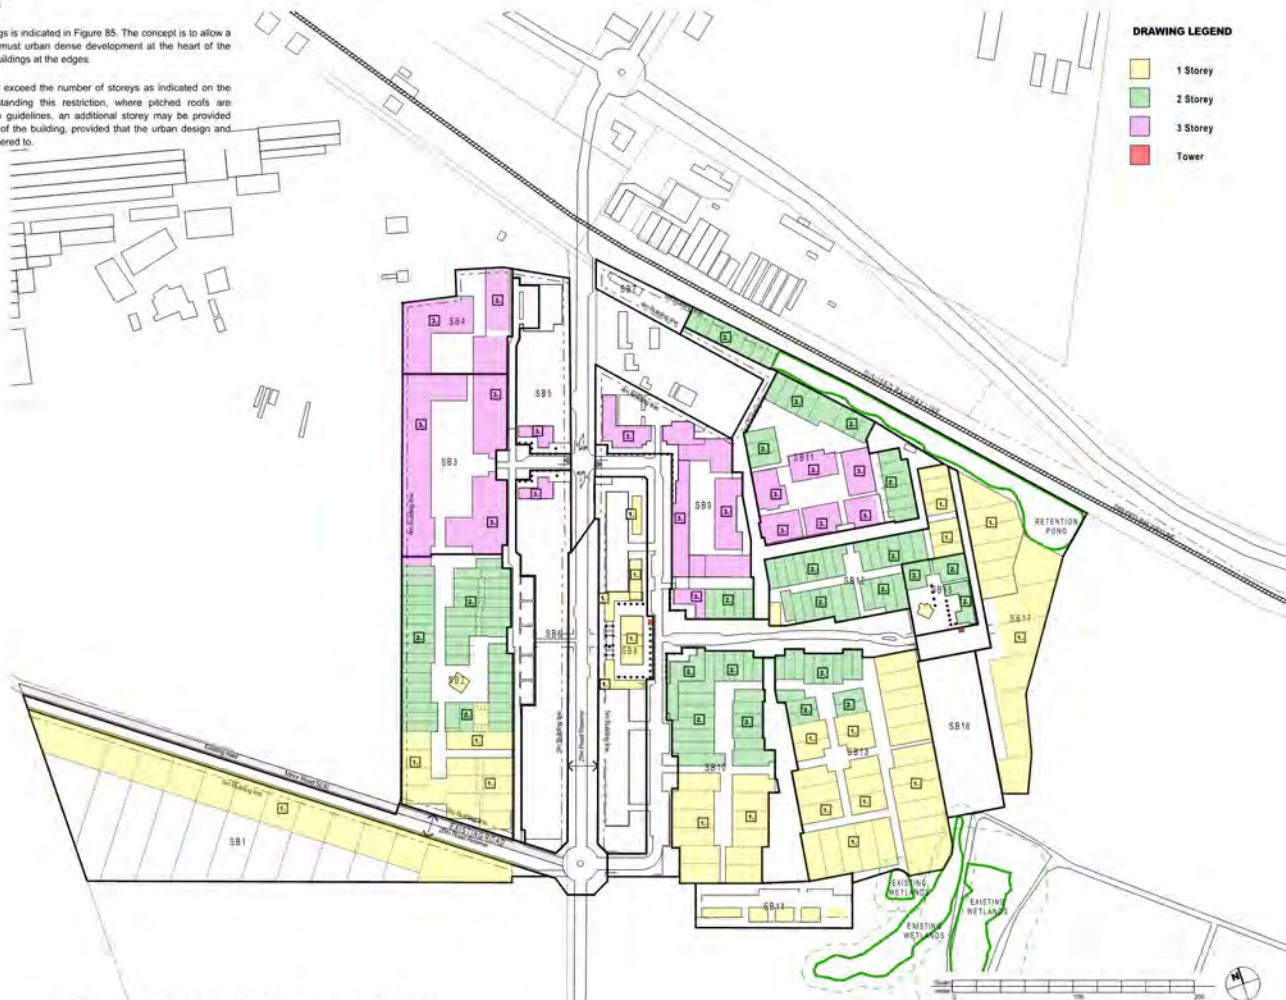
Maximum Permissible Building Heights | scale 1:3000 @ A3
